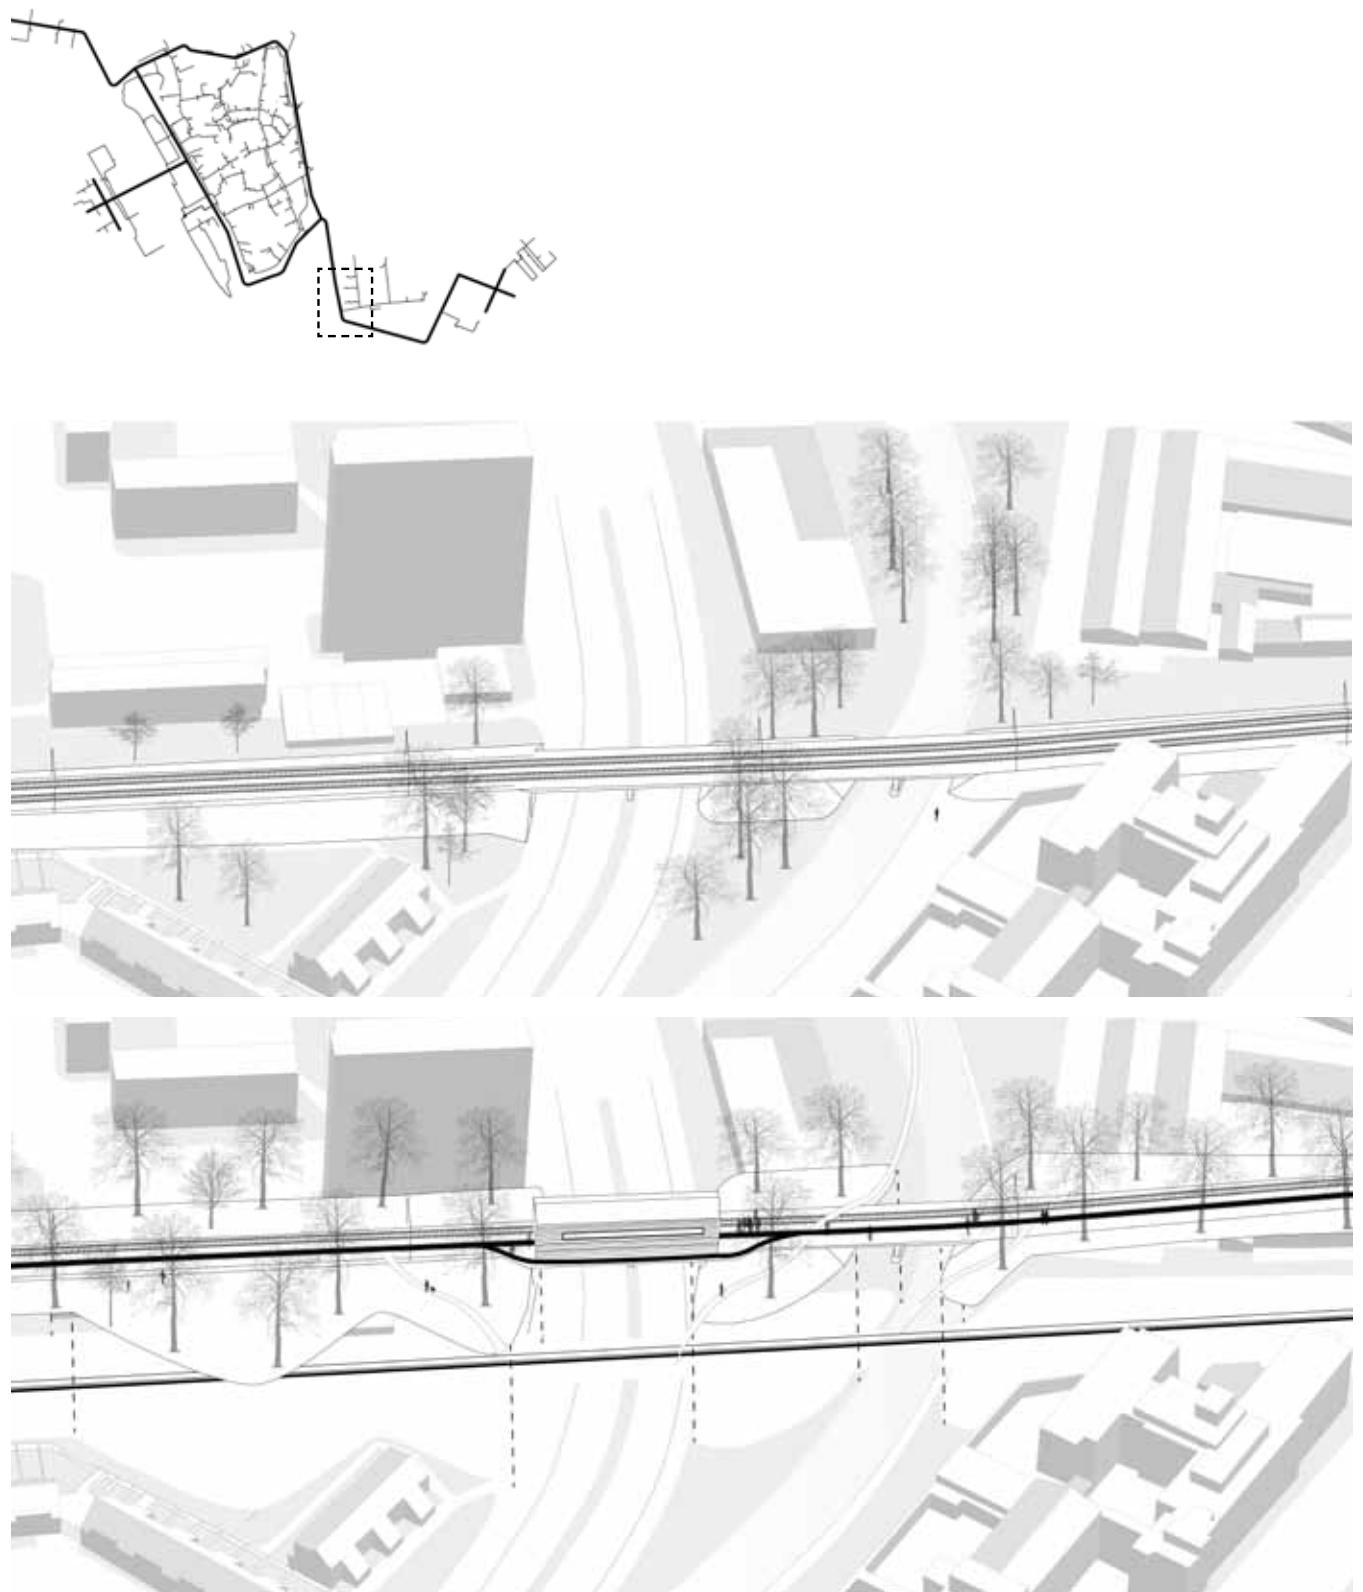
Detail plan of the Venuslaan/Kromme Rijn (current and future)
